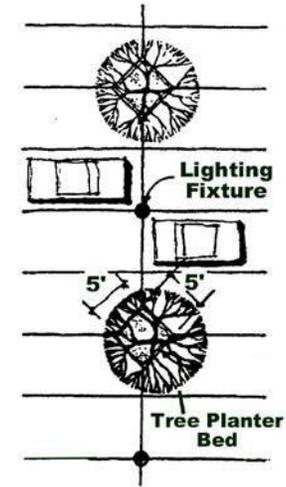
In mixed use and larger parking lots, tree planters can be 5' by 5' and alternated with smaller scale lighting and fixtures.
